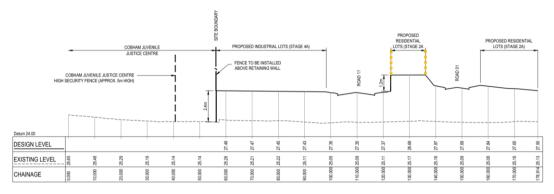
Bulk earthworks section (proposed under DA 19/0707) -western half
